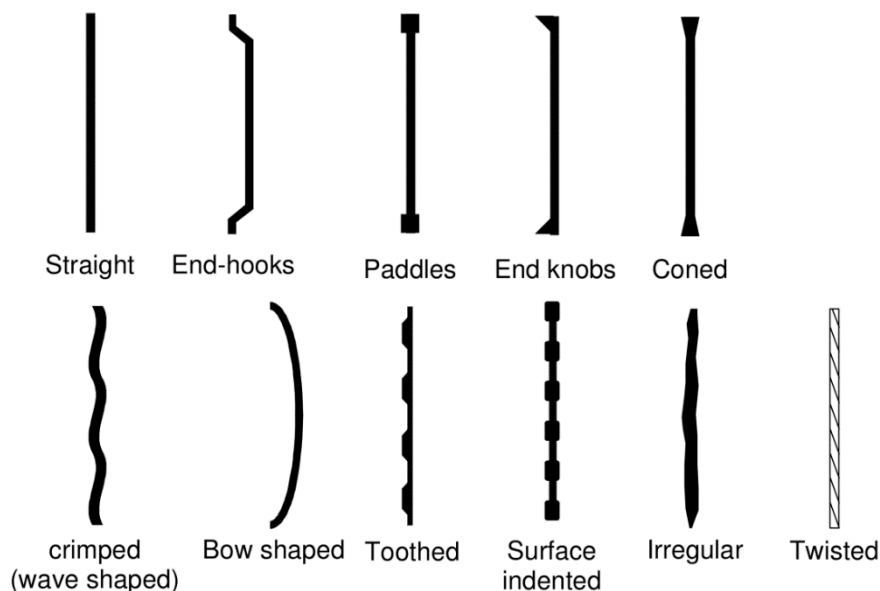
Typical profiles of fibres commonly used in concrete (Löfgren, 2005).
